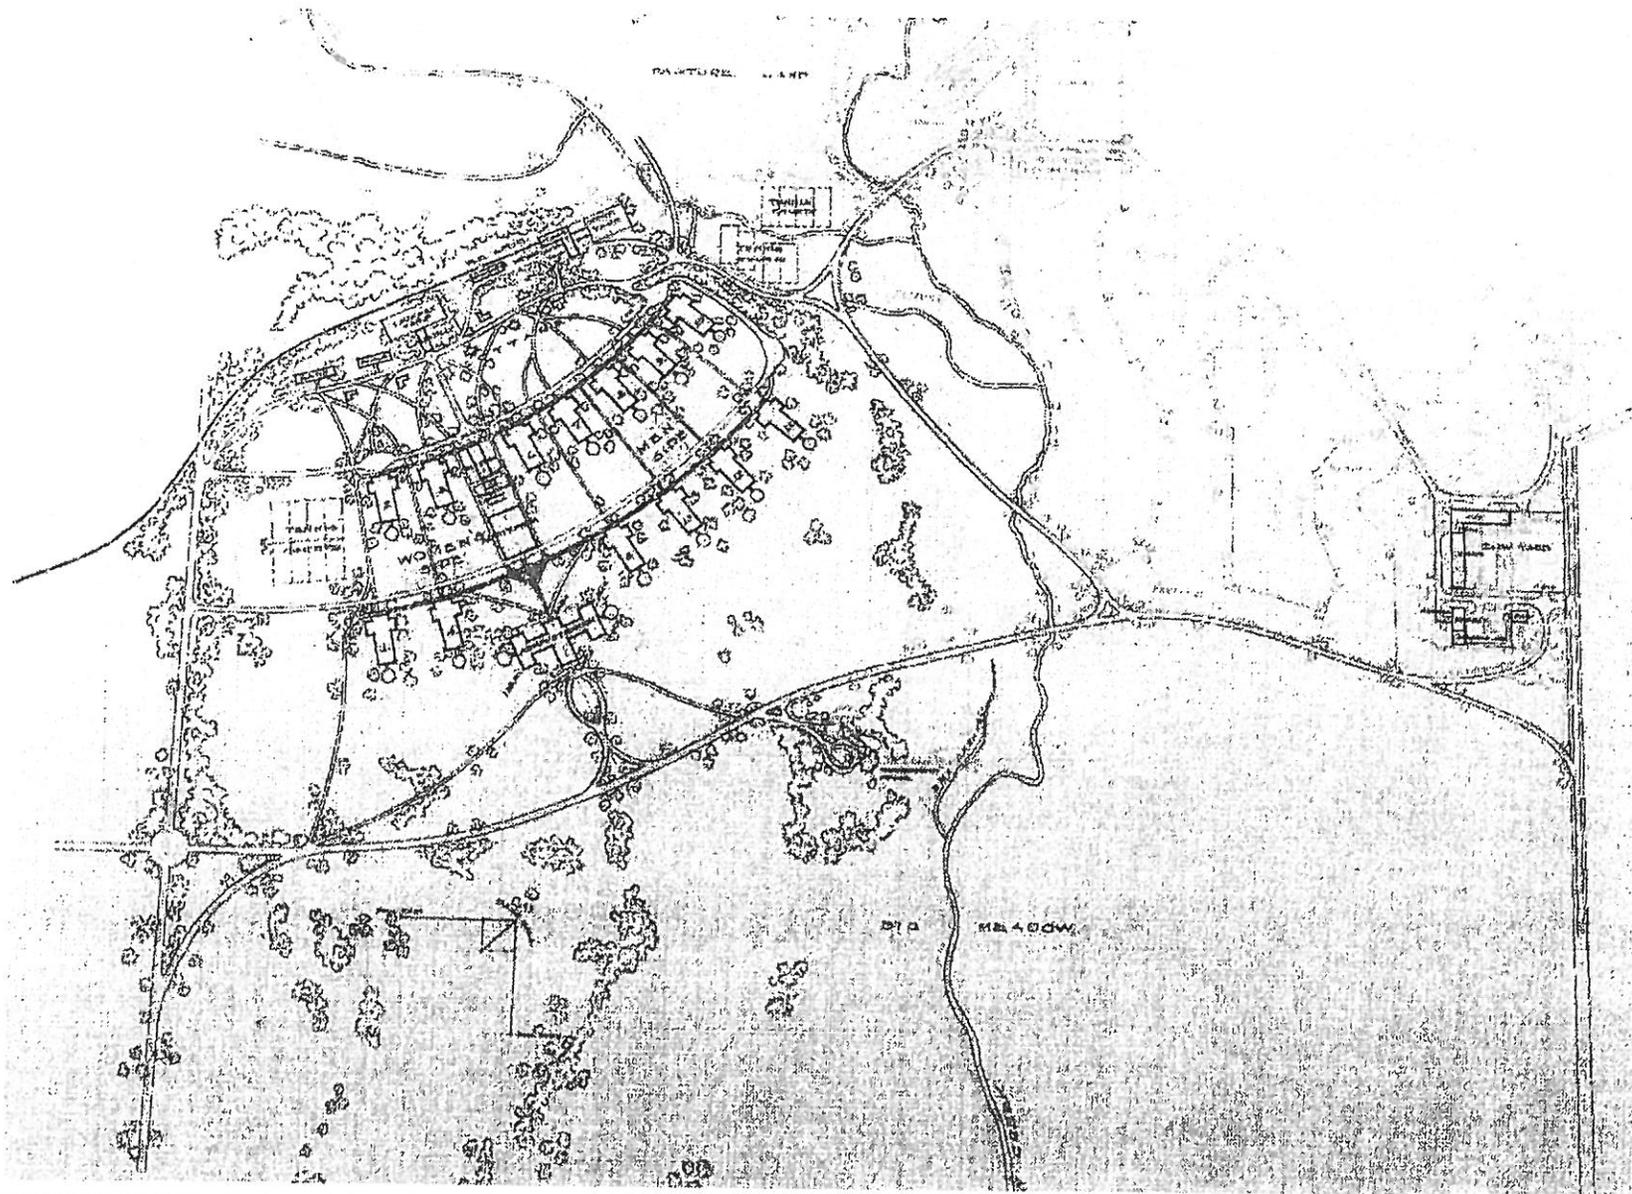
Olmsted Brothers Landscape Designers Concept Plan, Northern State Hospital, 1911.
